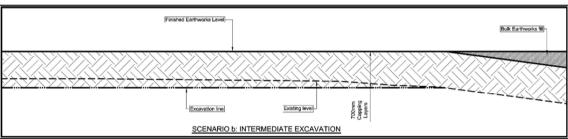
Intermediate excavation scenario (source: Walters, 2020)
